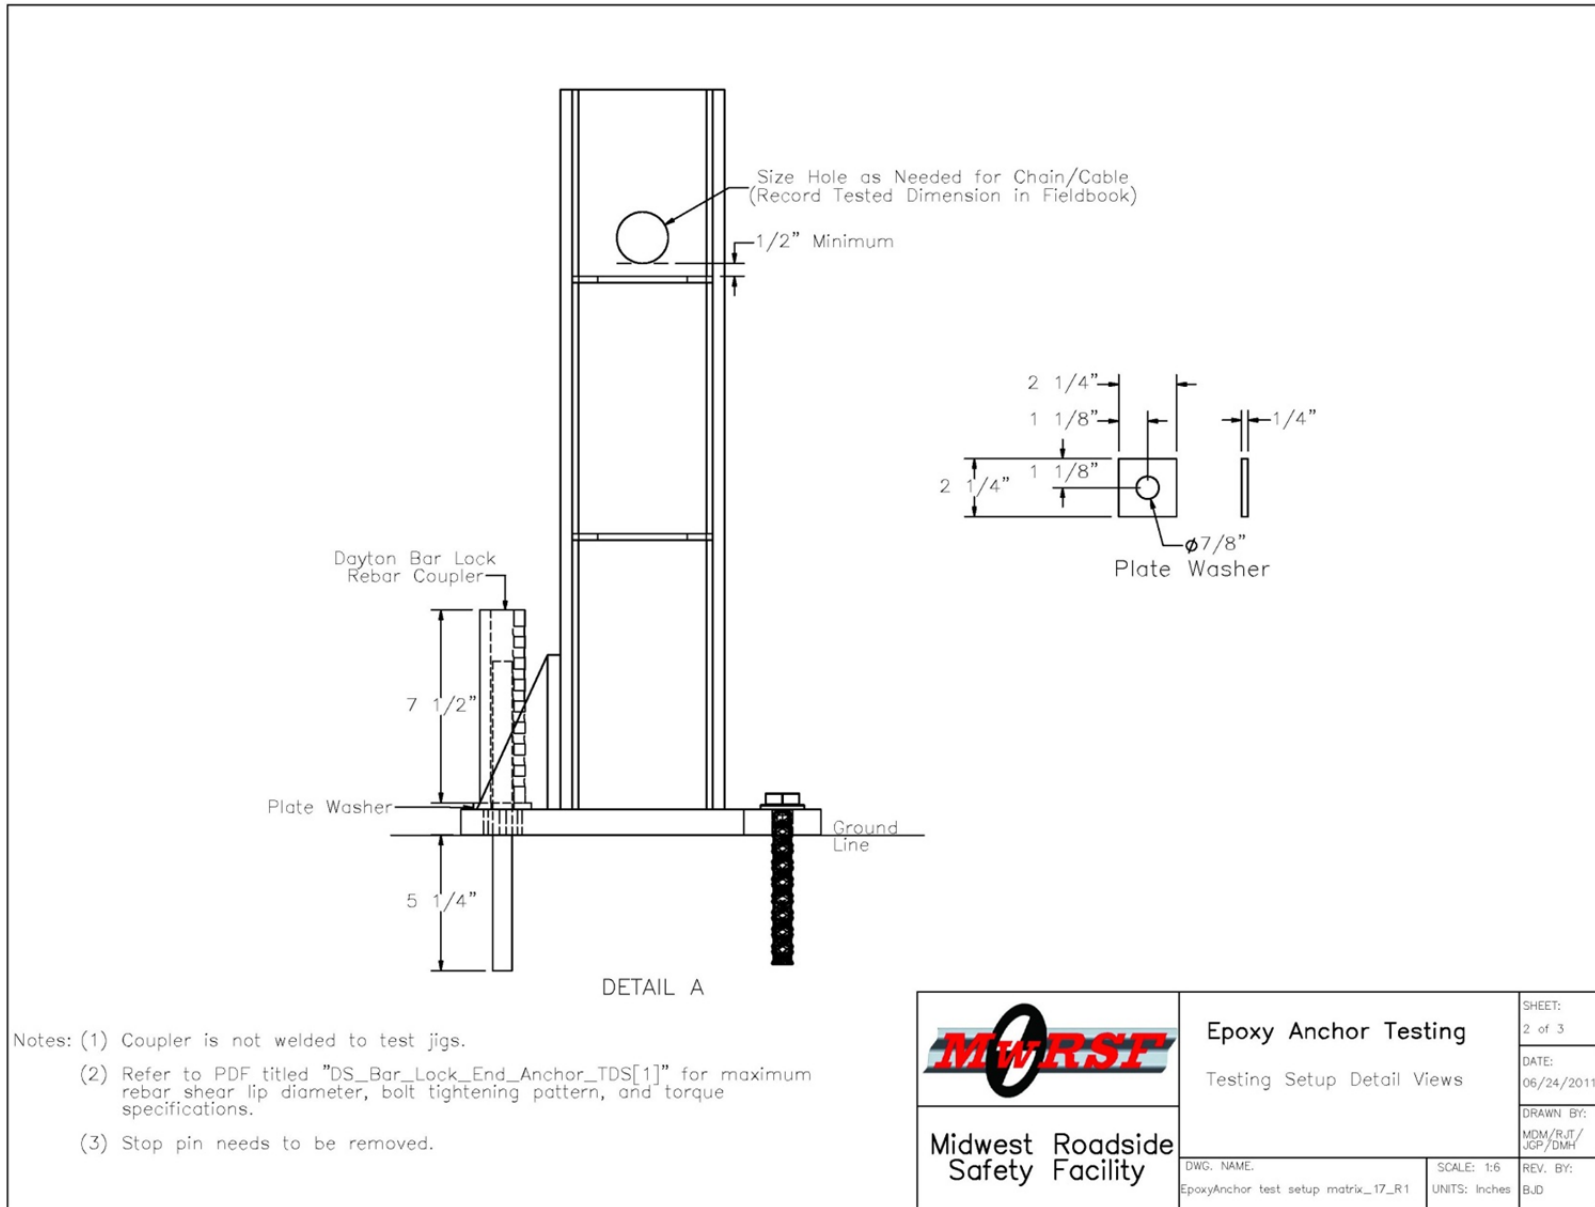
Anchor Attachment Details, Test No. WEAB-17
